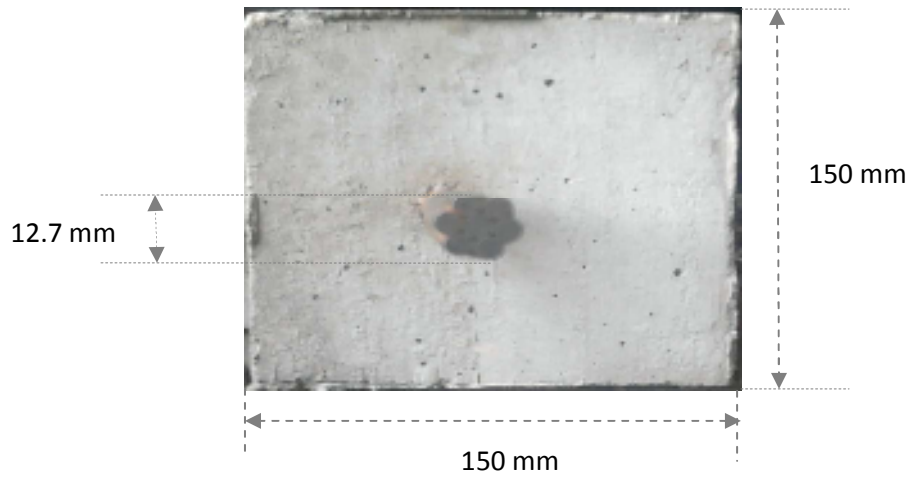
(b) Cross-sections of concrete beam with pre-stressing tendon
